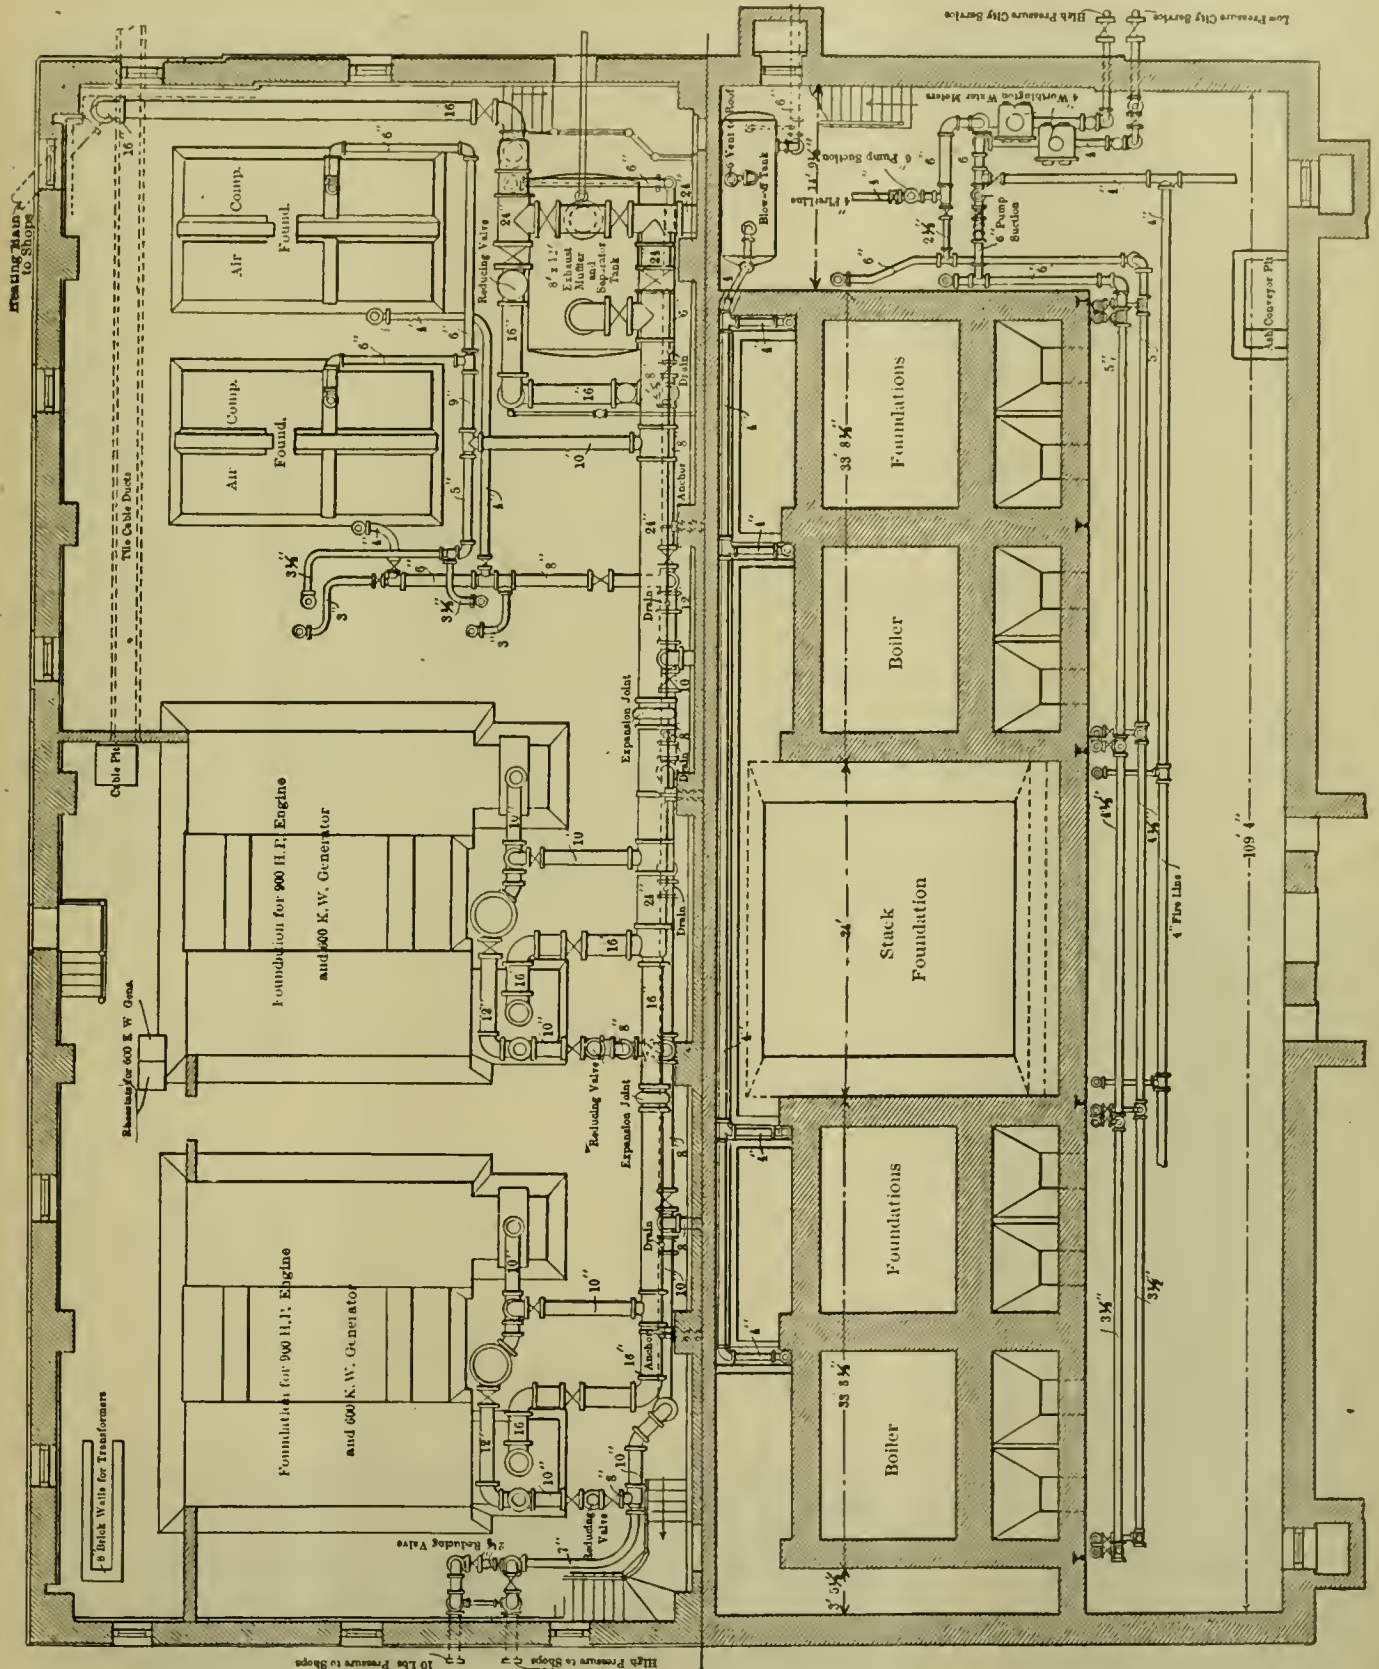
BASEMENT PLAN OF BOILER AND ENGINE ROOMS. WEST ALBANY POWER PLANT—NEW YORK CENTRAL RAILROAD.
